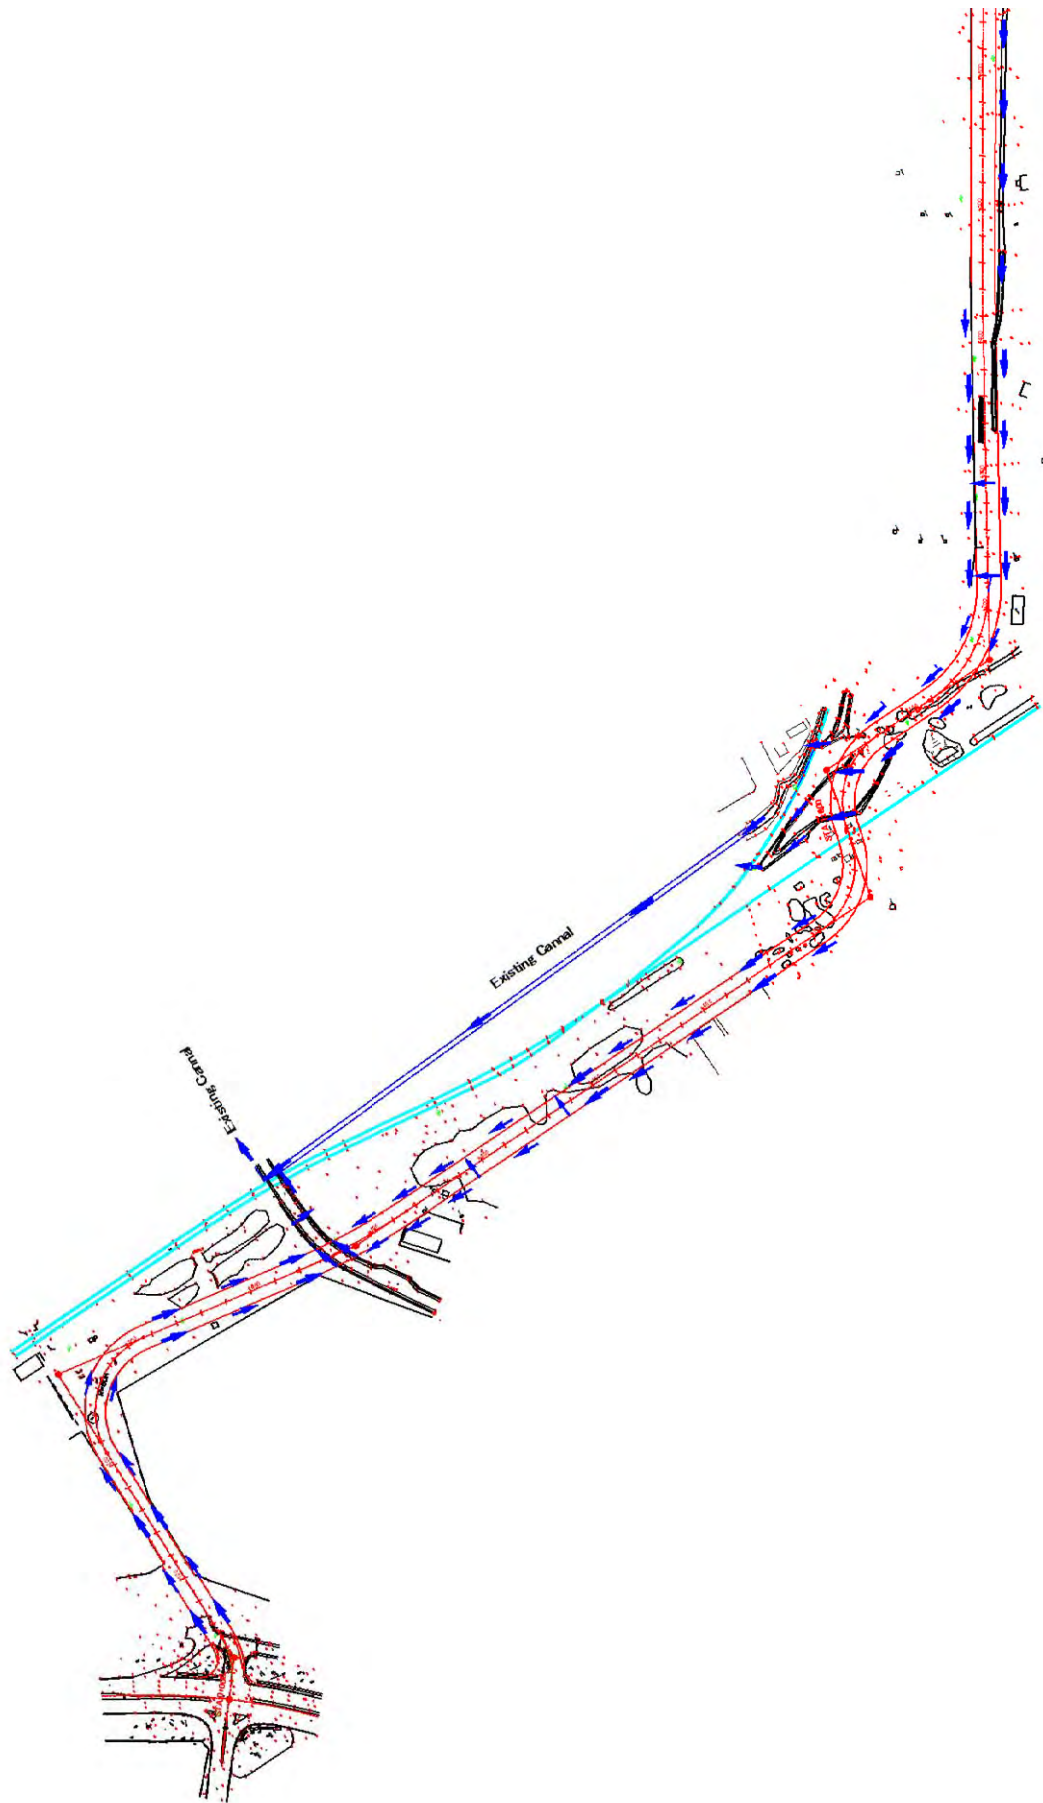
Plan of Drainage Route from Mosi-Oa-Tunya Jct. - LS-MFEZ to Inner Ring Road
